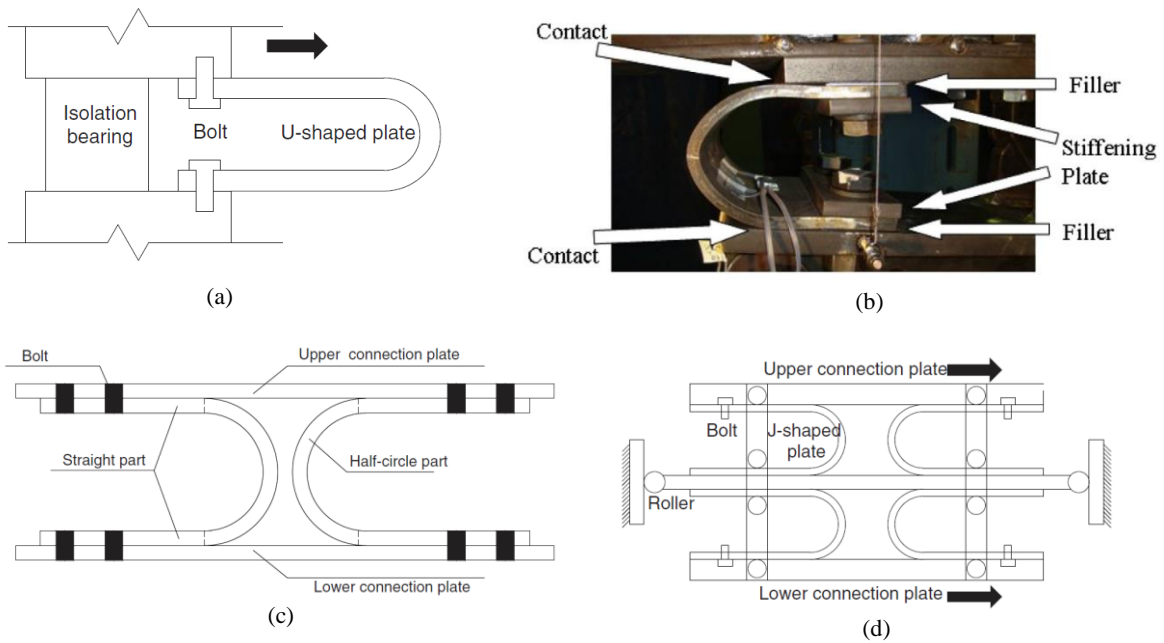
(a) U-shaped damper for bridges; (b) U-shaped damper under compression deformation; (c) Crawler steel damper and (d) schematic view of J-shaped damper
